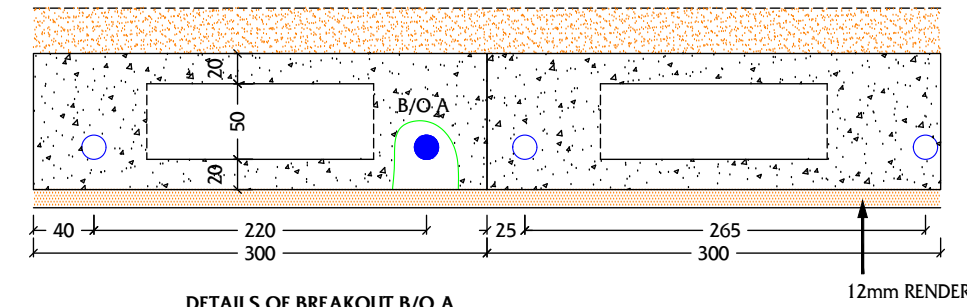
PART SECTION LOOKING SOUTH THROUGH 1ST FLOOR SLAB SHOWING PRECAST CONCRETE PLANK CONSTRUCTION DETAIL - SURVEY AREA L-K/2-3 SCALE 1:20
